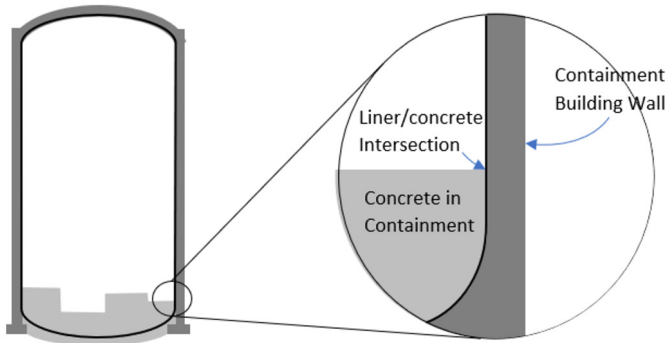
Containment liner at the intersection of an interior horizontal concrete surface
